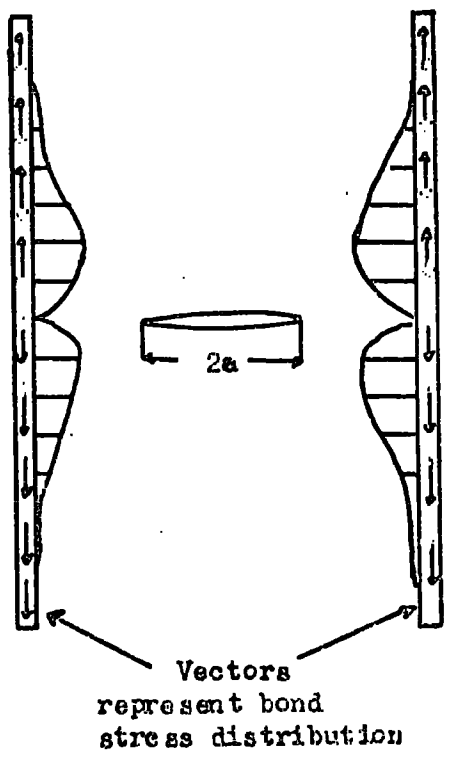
Section 'A-A' Through Wire Reinforcement.
